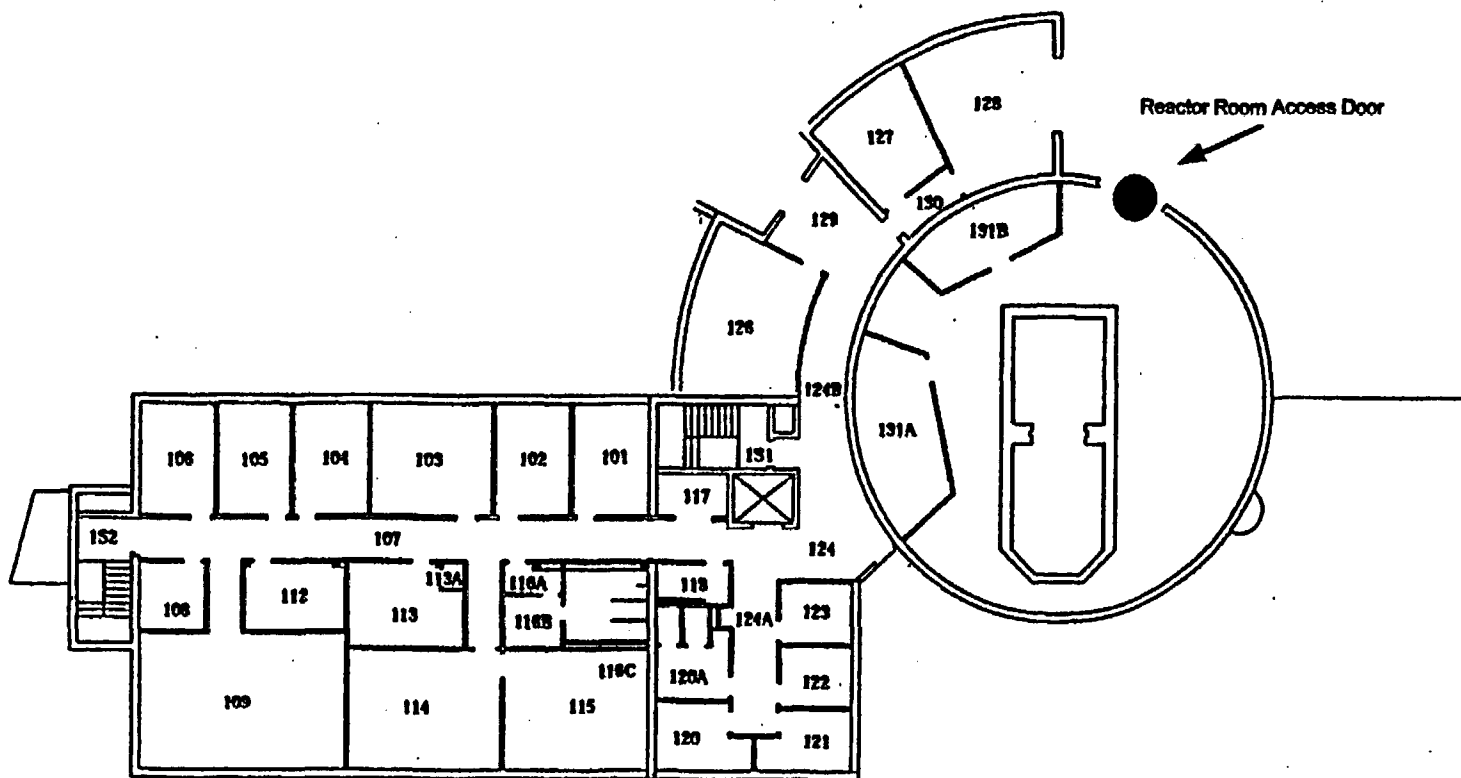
UVA Reactor Floor Plan View Indicating Roof Areas.
